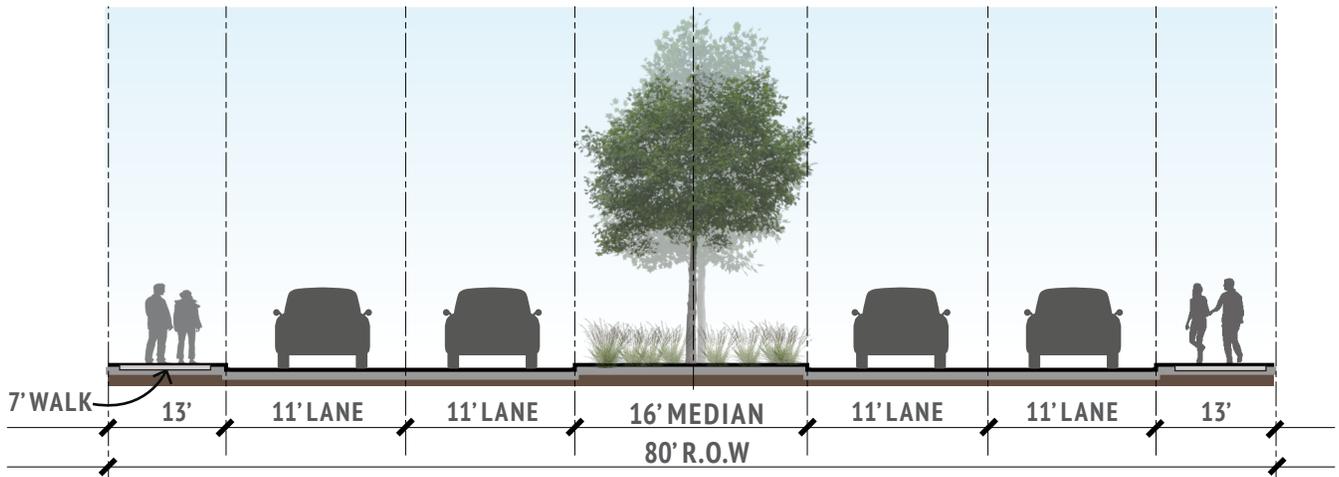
■ TYPICAL SECTION - STREET TYPE B
